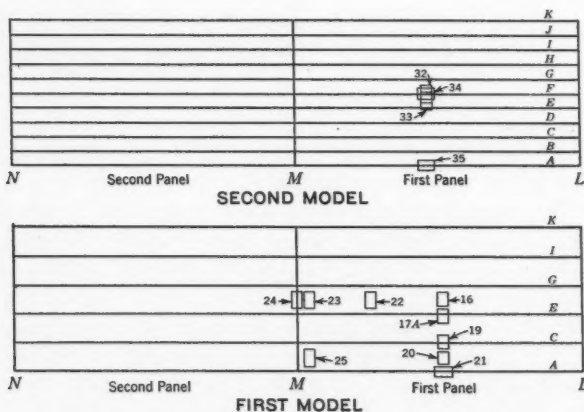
LOADING POSITIONS FOR FIRST AND SECOND MODELS
